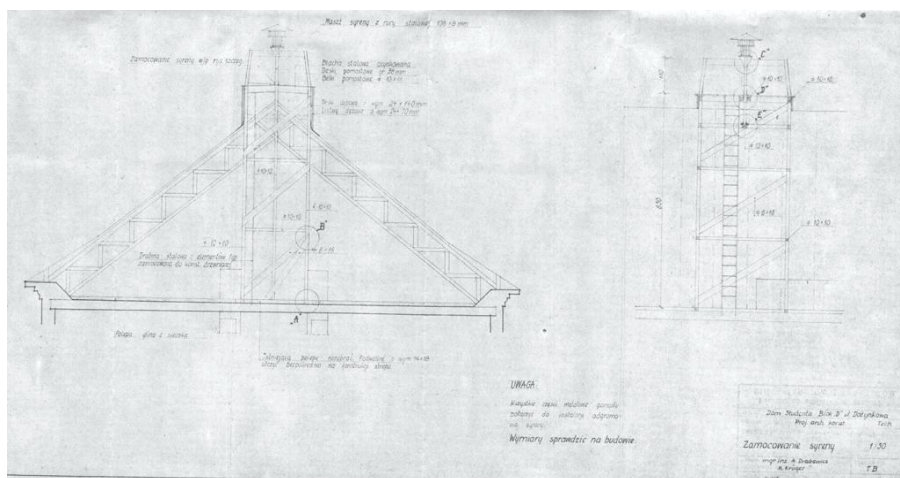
Fragment of the design documentation of the dormitories at 9A and 9C Dożynkowa Street in Poznań, a cross-section through the roof truss. (Source: Archives of the Poznań City Hall)
